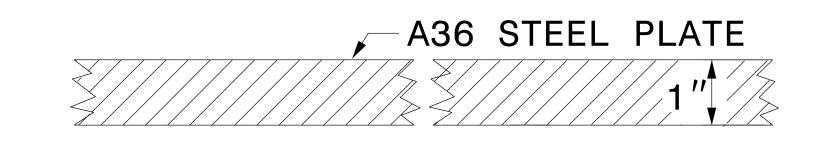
Detail of Temporary 1" Steel Covers Over Pits or Drainage Structure
